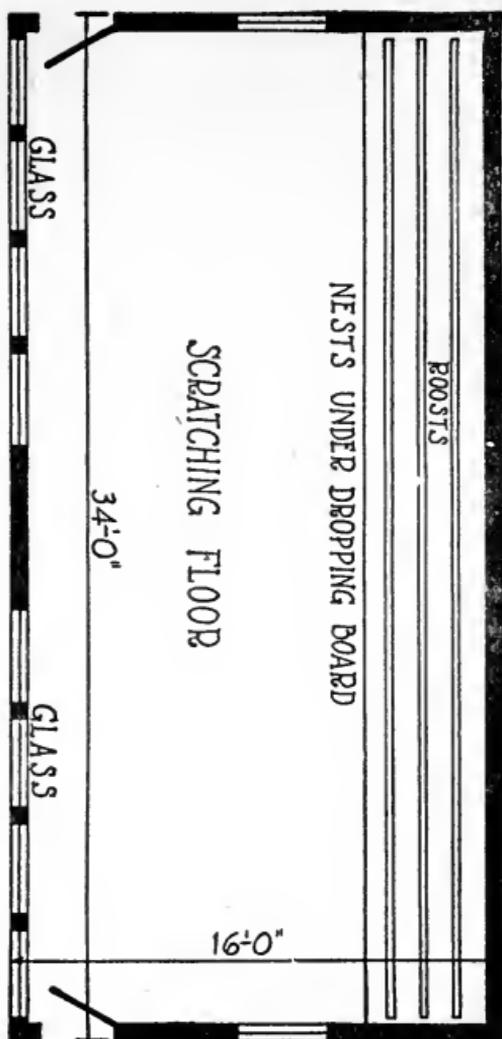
Floor Plan of Winter Poultry House, Showing Roosts and Nests Placed at the Back Under the Low Roof
